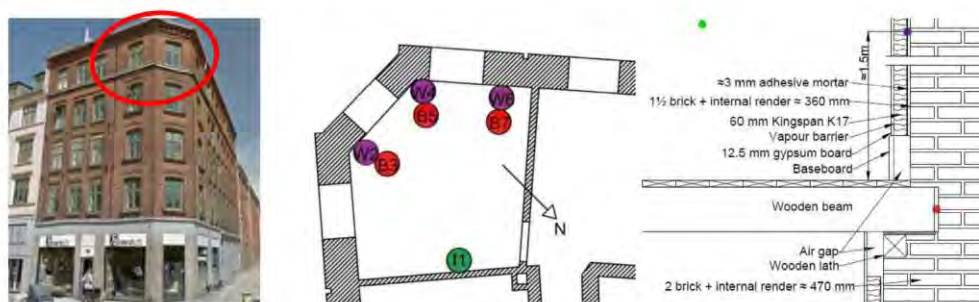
left to right; Meinungsgade facade with indication of insulated walls, sensor placement on floor plan, and construction with sensor placement.
